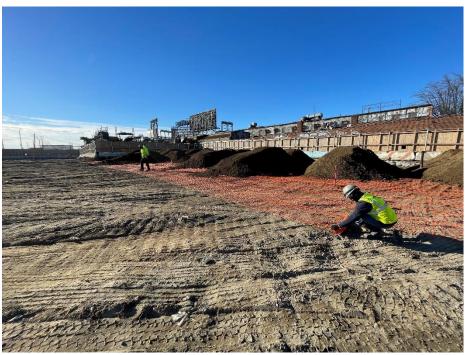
Triumph excavating and stockpiling historic fill and concrete on the Site (facing south). – 1/14/2023
